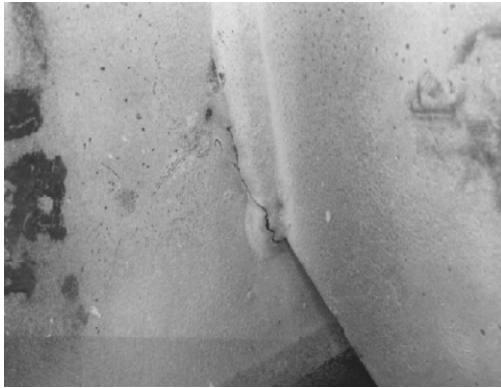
Cracked girder in Yellow Mill Pond Bridge, Connecticut (Fisher 1984)
